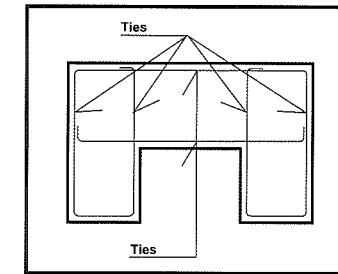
Peripheral Ties In Floor Layout With Internal Edges
